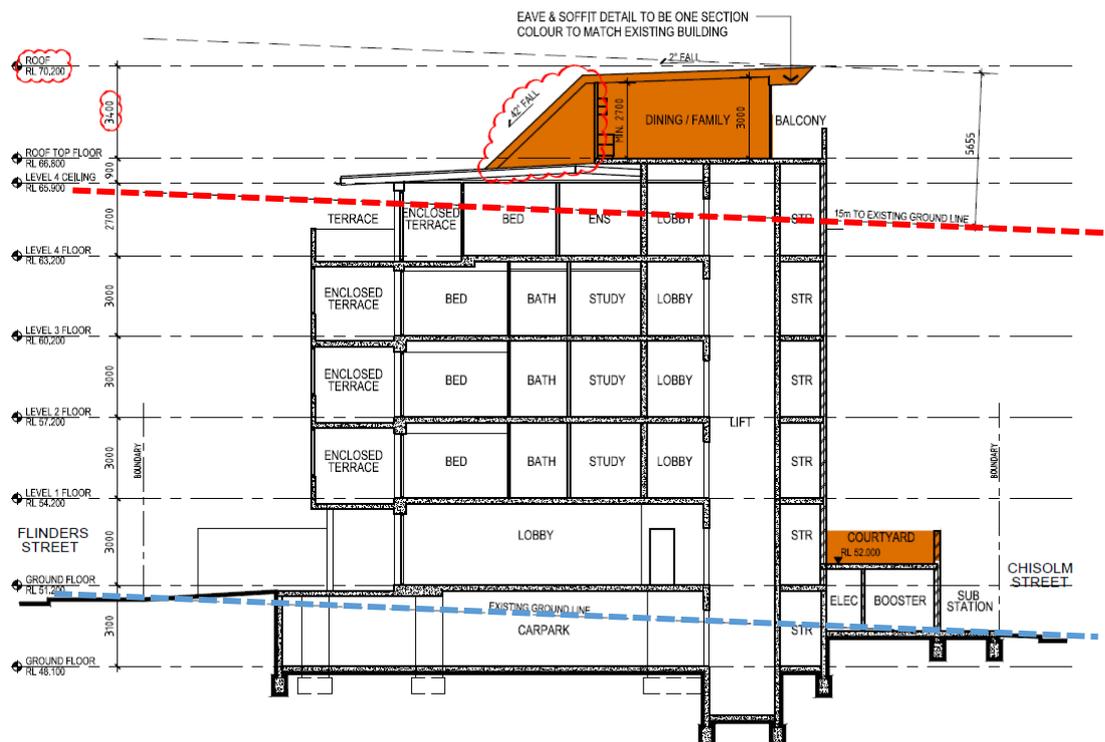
Section A-A through the existing building and proposed addition showing the 15m height limit.
